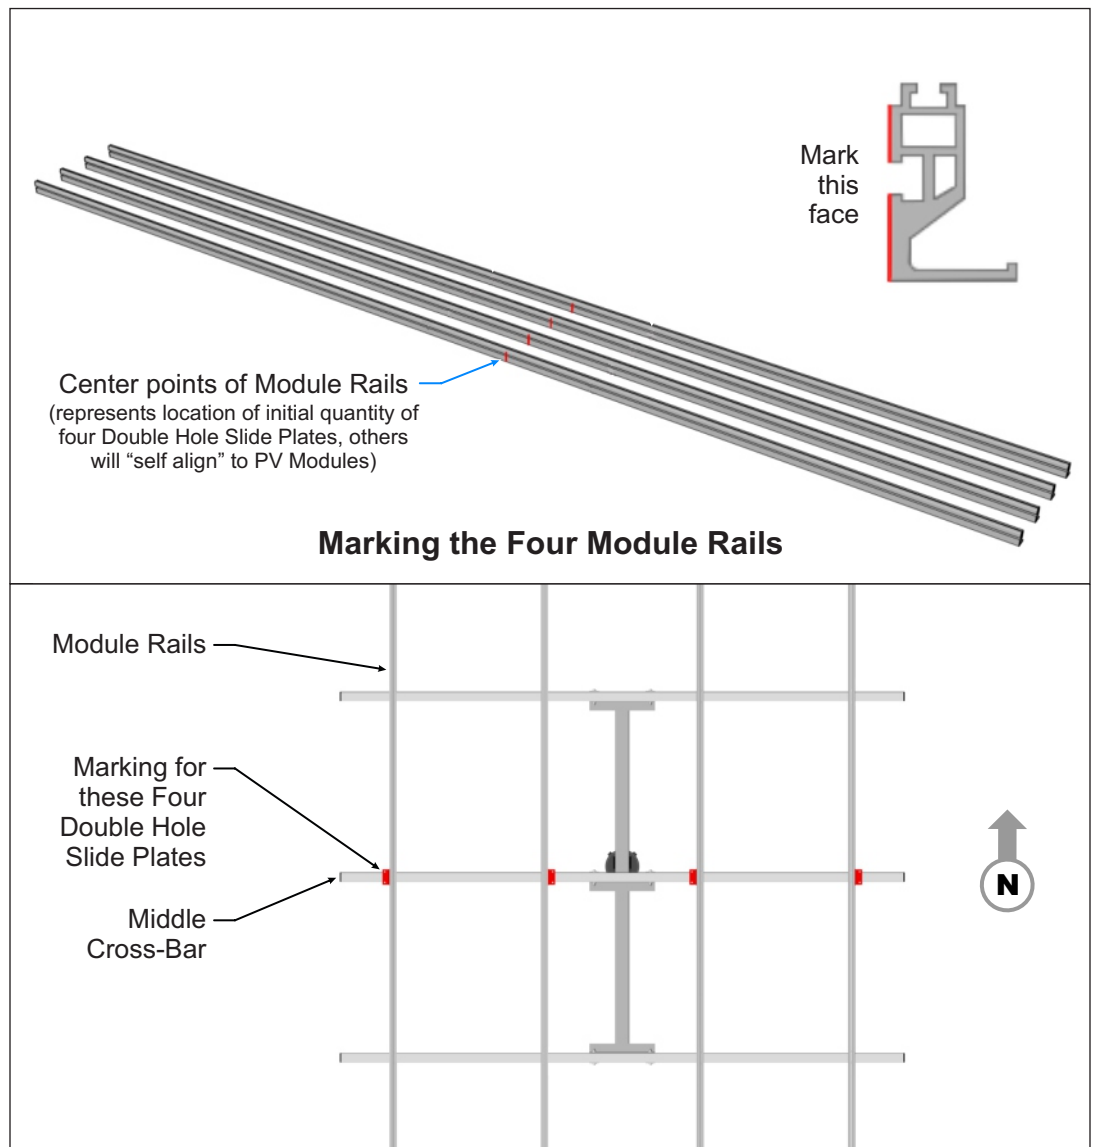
Marking the Module Rails for Double Hole Slide Plate Positioning
